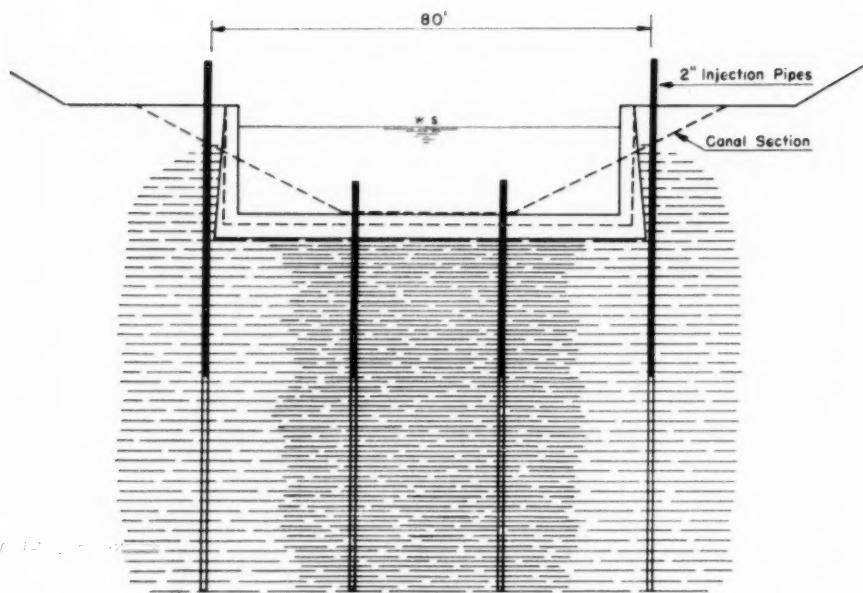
Plate II shows the cross-section of a concrete headwork structure, four holes drilled to solid material, four two inch injection pipes extending fifty feet below surface of the earth and a sufficient amount of consolidation to prevent settlement of the structure. If complete consolidation is desired, it is necessary to space the holes on six to ten foot centers.
